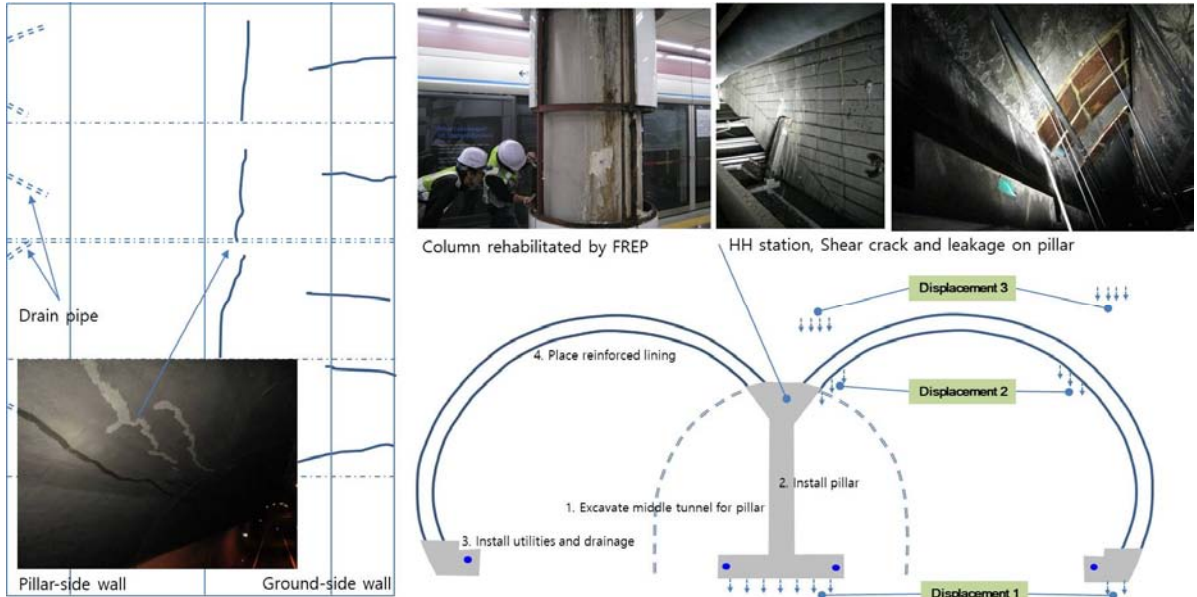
Characterized cracks on double arch tunnel and typical defects in pillar area
